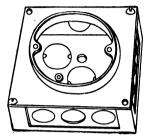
Universal and Knock-Out Type of Outlet Box.
